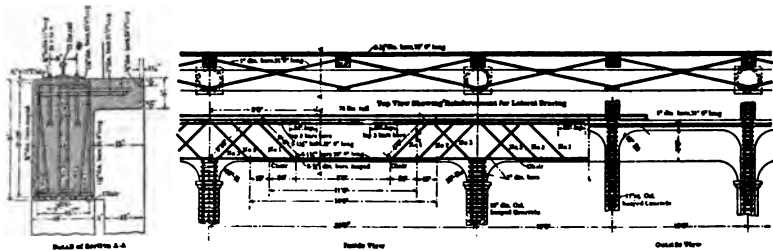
Crane Run Girder, Taylor-Wilson Mfg. Co.'s Shops.
